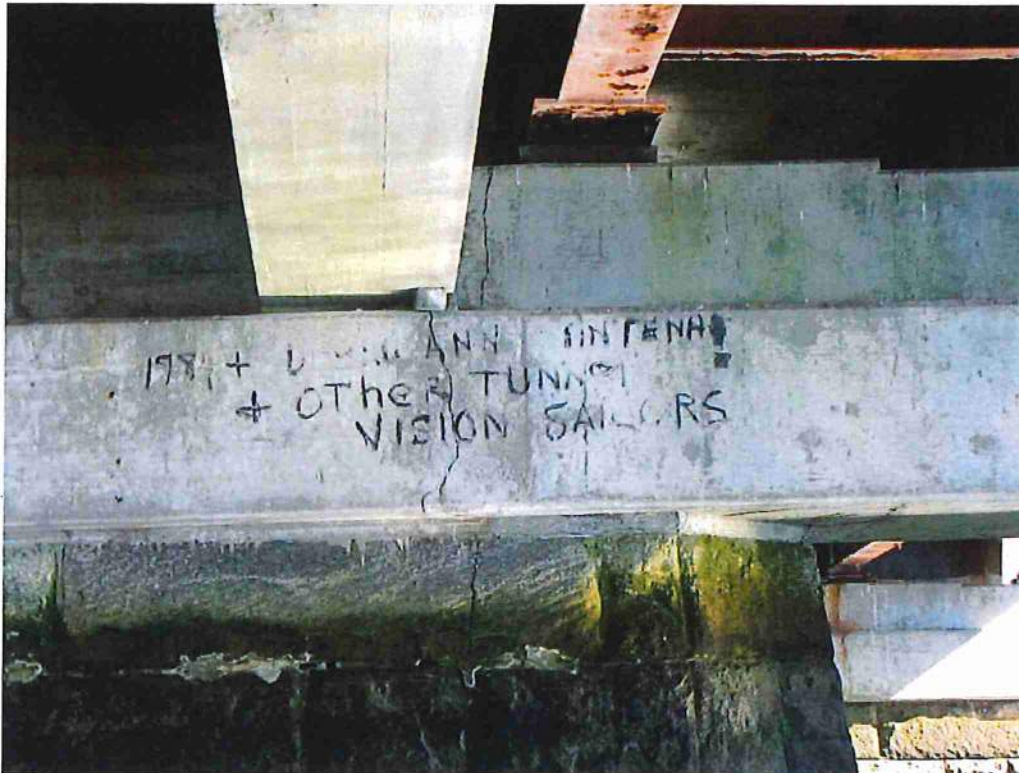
Close up of previous photo. Cracks in cap extending down into first block
